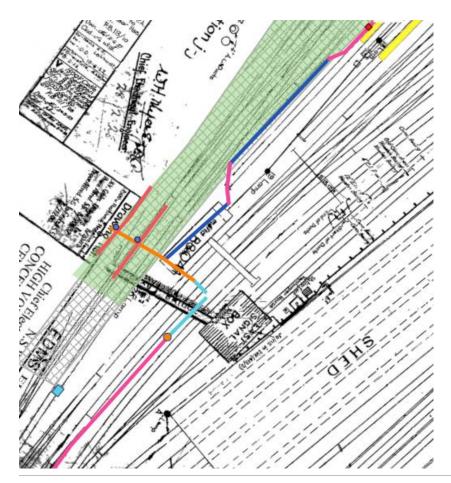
Traffic Cable building shown on the c.1925 High Voltage Cables Plan: Central to Macdonaldtown. Source: Mountains Heritage 2021 Figure 3.3.
